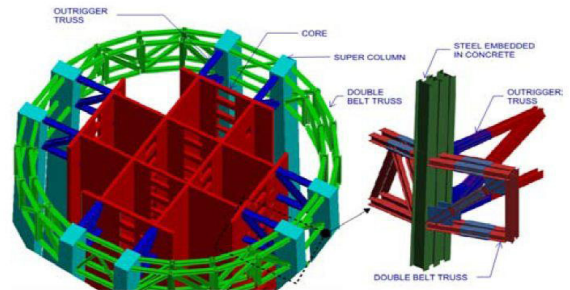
Megaframe for Shanghai tower and outrigger detail
